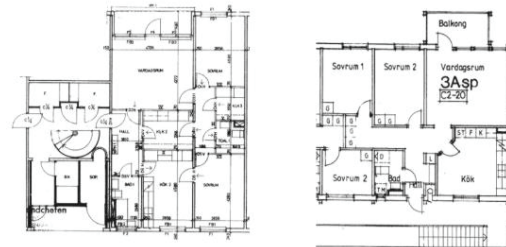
Floor plans showing the layout of a two-bedroom apartment in Norra Bergsjön (left) and Lerum (right).
